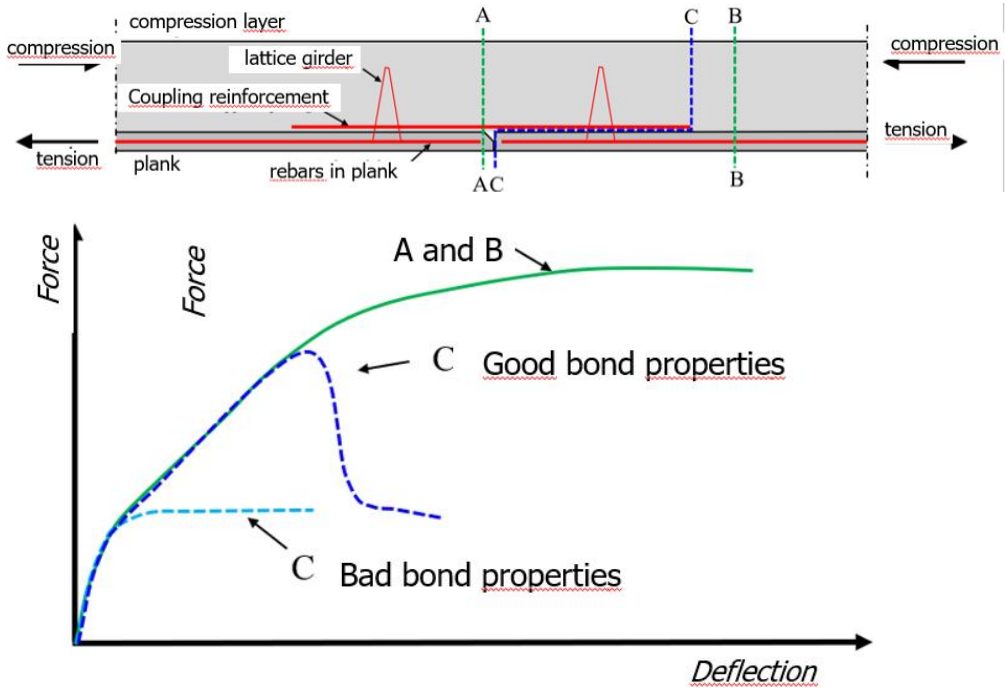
Load-deflection relations (schematic) for the critical detail in case of failure by yielding of the coupling reinforcement (A), the reinforcement in the precast composited plank (B), and failure along the interface between precast and in-situ concrete with good or bad bond properties (dark blue and light blue dotted relations).
